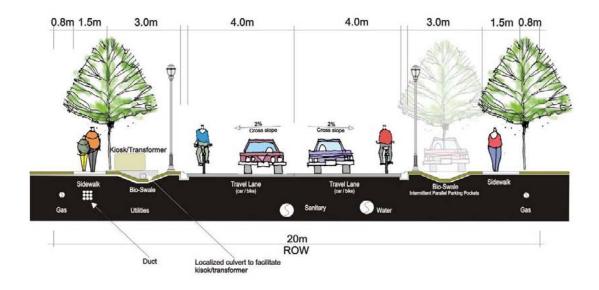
Internal Roadway Cross-Sections - Collector (Sunnycrest Road) Options
